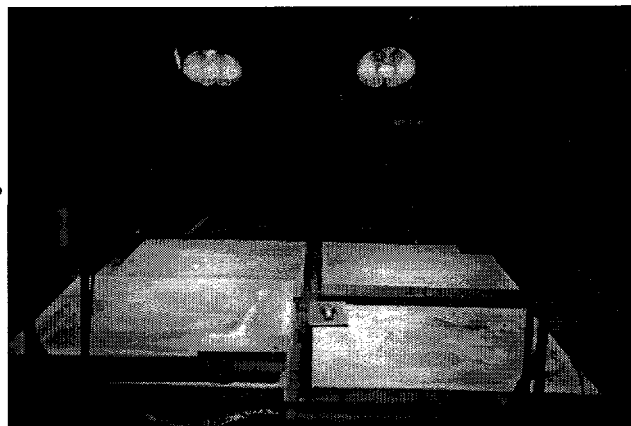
The cold test modeled site conditions as close as possible including building heat and concrete specifications
